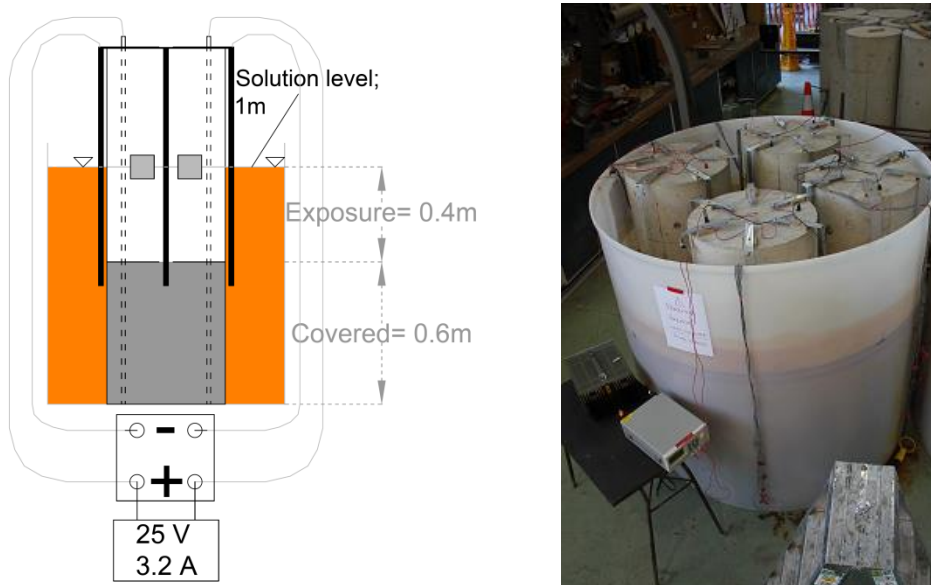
Details and a photo of corrosion test setup of RC columns
